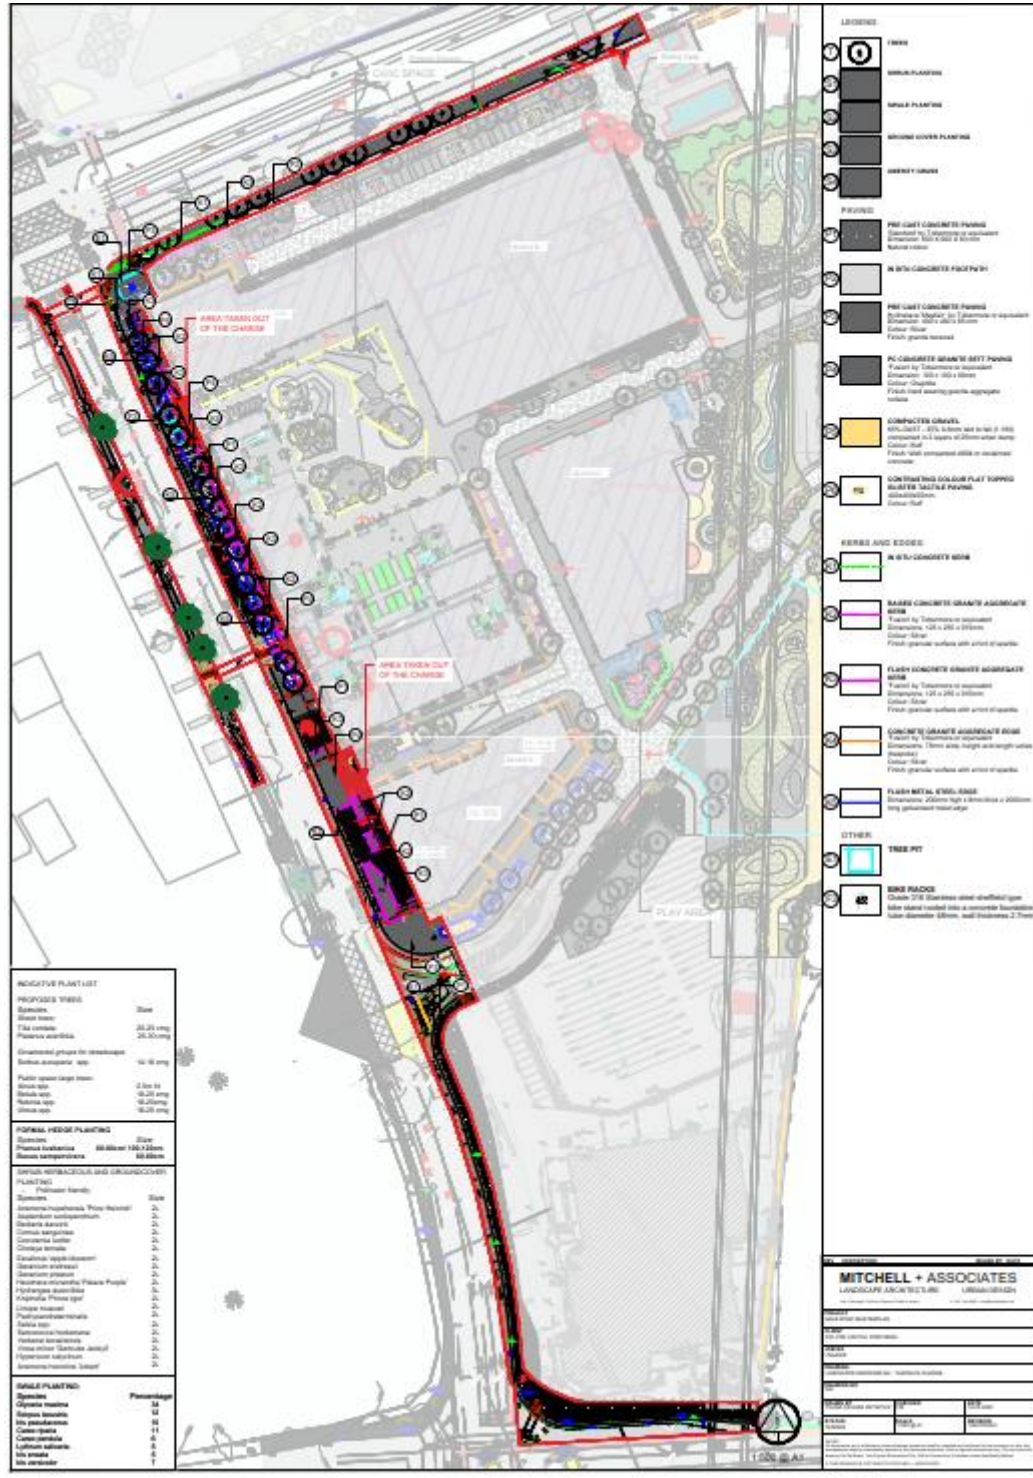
Mixed Use Development, Naas Road / Walkinstown Avenue.
